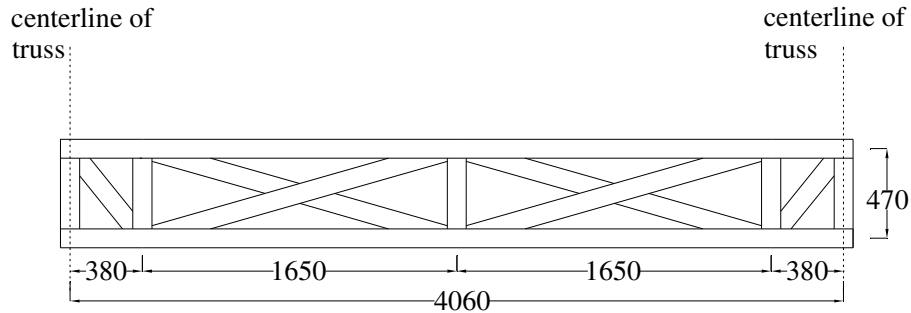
Lattice floor beam made from 4mm thick ST100 section
